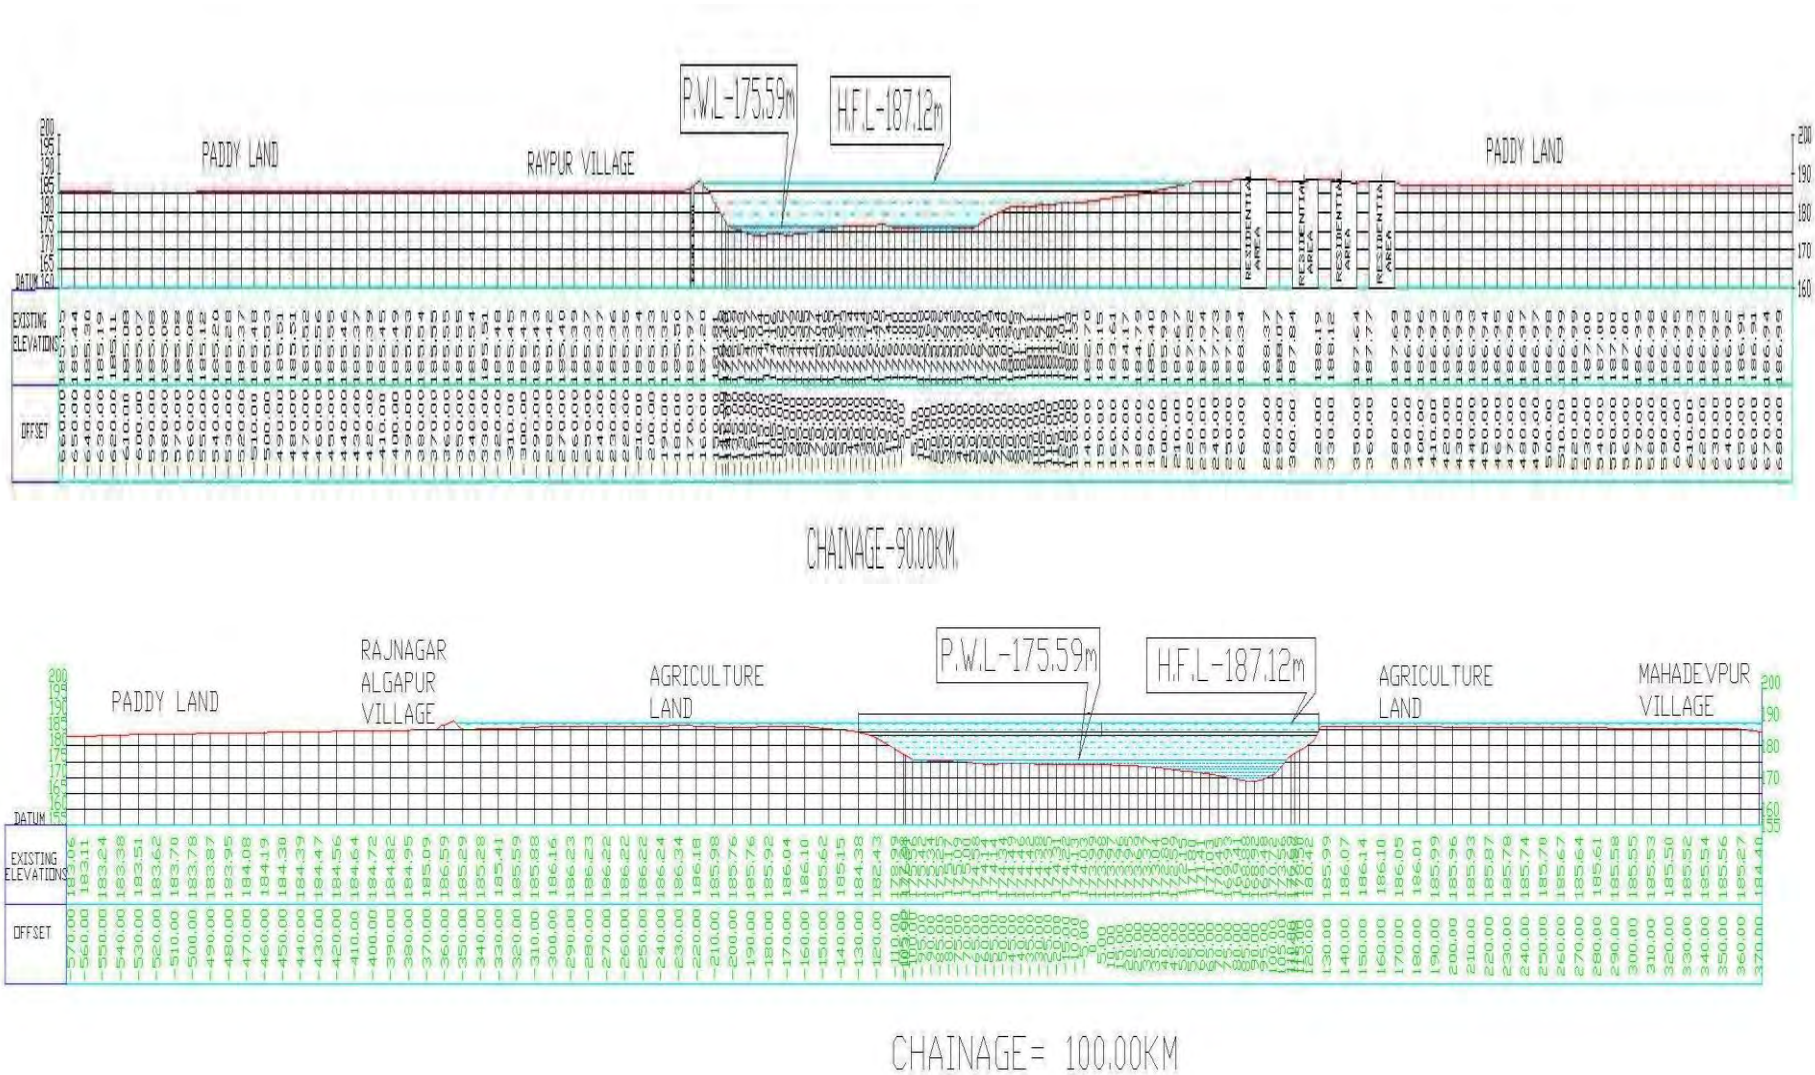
(e) Section Details of Barak River upto 500m in the countryside
